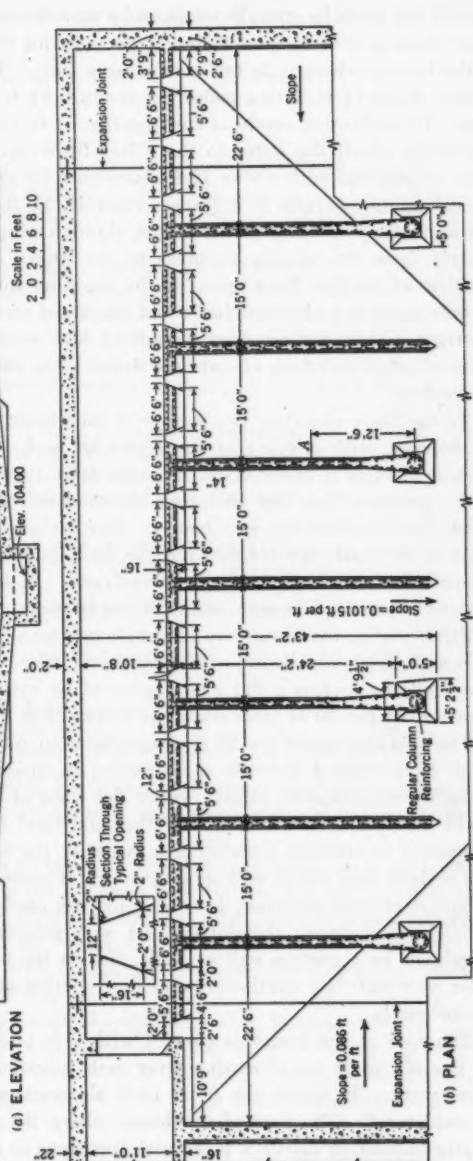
PLAN AND ELEVATION OF SETTLING BASIN INLET
